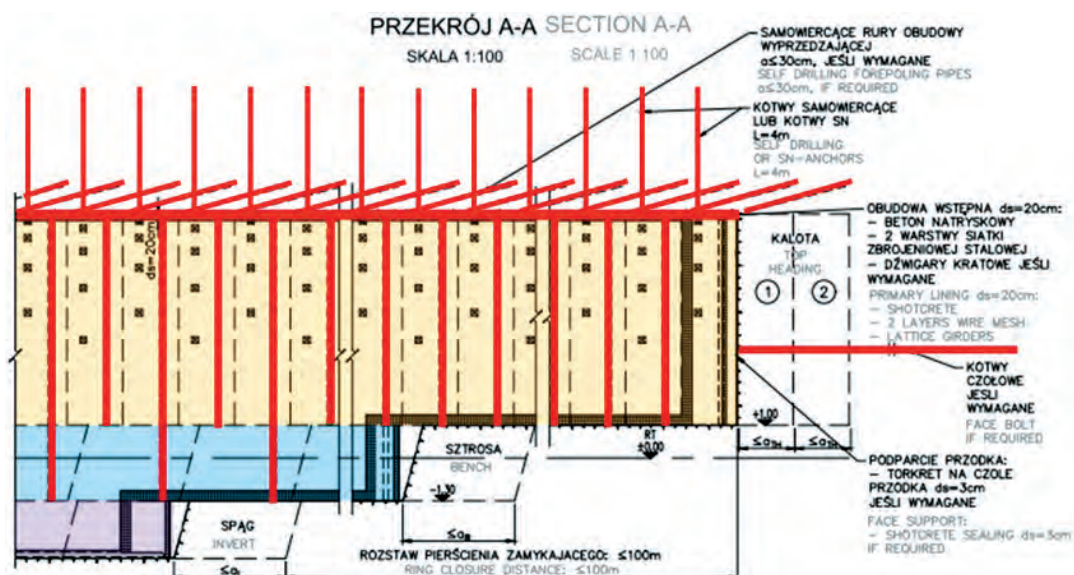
Support class D10, cross-section A-A of a pit subdivision with elements of the primary [3]
